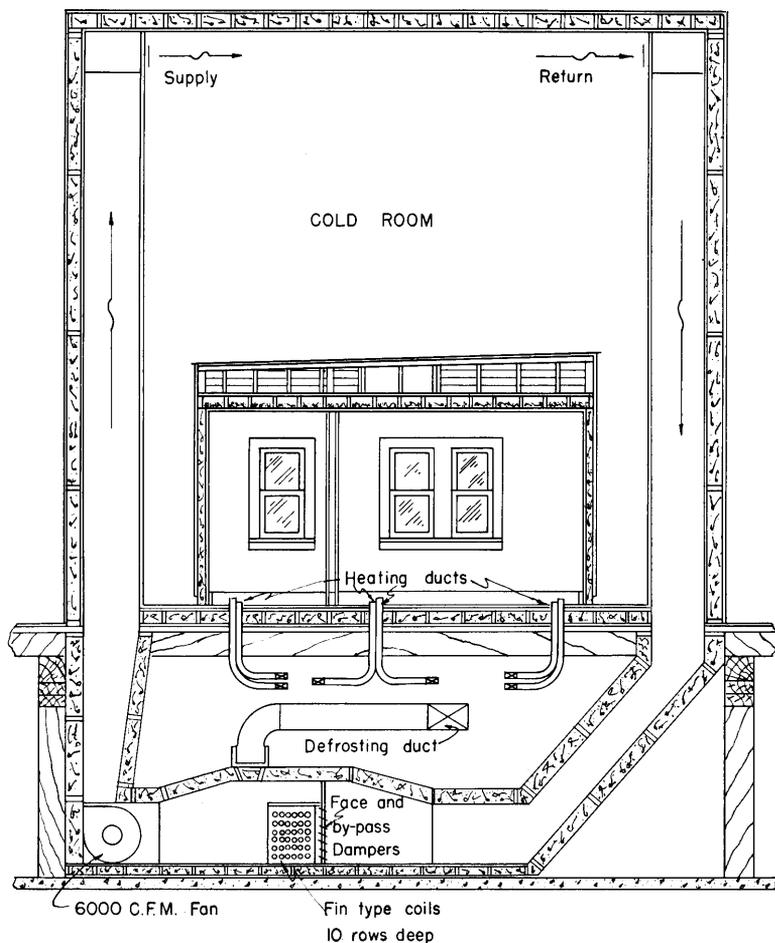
SECTIONAL VIEW THROUGH COLD ROOM, TEST BUNGALOW, AND COOLING UNIT.
